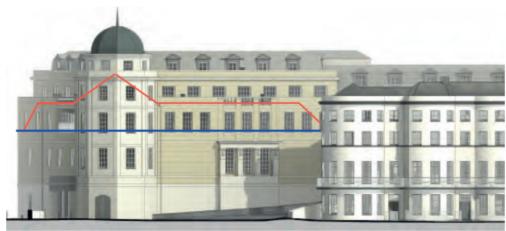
Proposals From Four Locations: Shelley Road & Liverpool Gardens, Liverpool Road and Chapel Road/South Street
